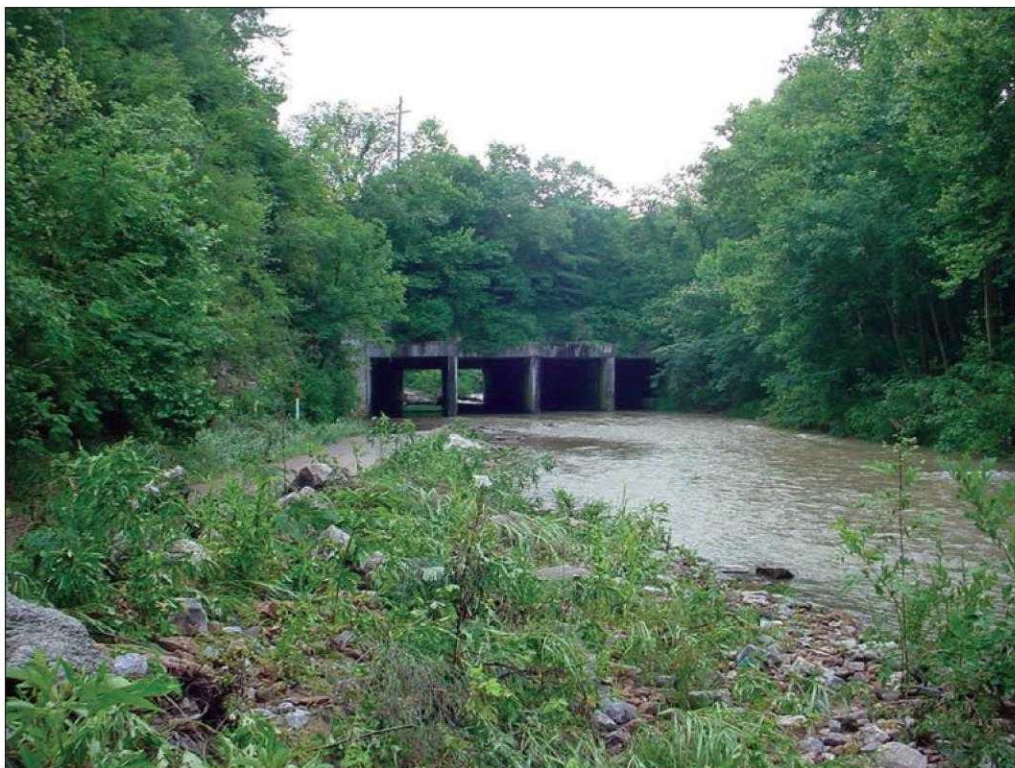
Cross section A, outlet of the box culvert at the L & N Railroad in Tarrant, Alabama. (See figure 5 for location.)
